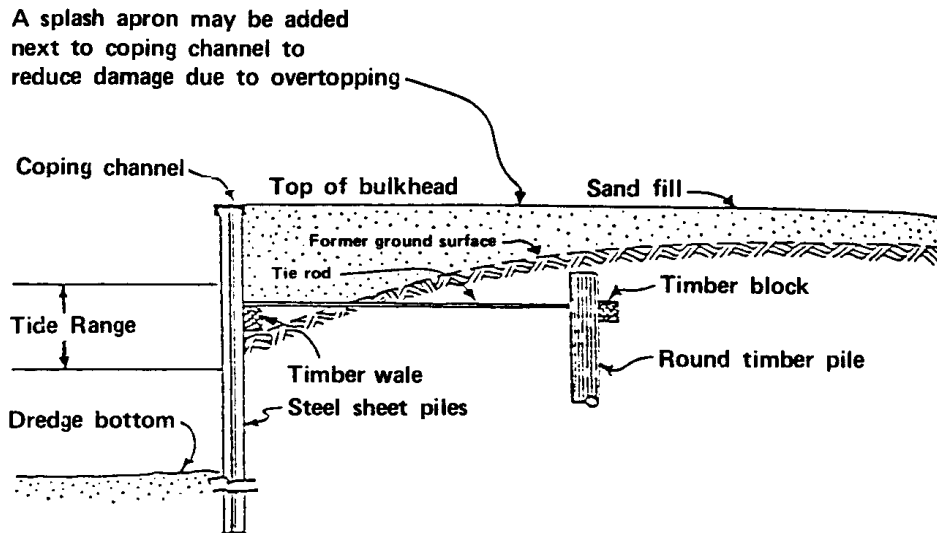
Steel sheetpile bulkhead, Nantucket Island, Massachusetts.
